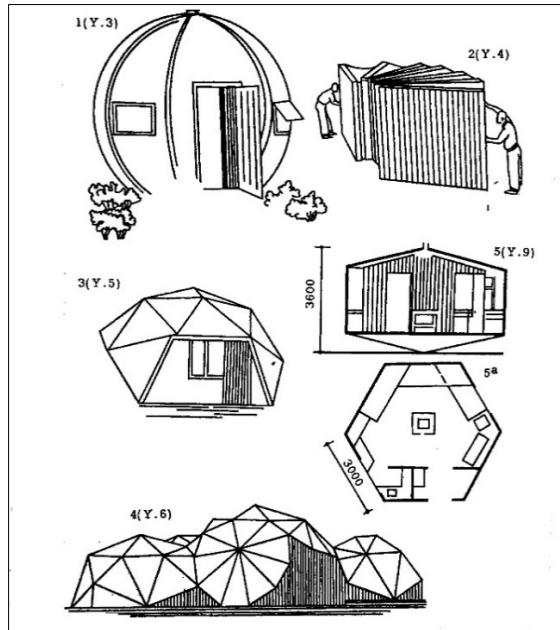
Prefabricated and portable housings in abroad 1-Spheric house (Germany) 2-Accordionic dwelling (USA) 3-Camping house (England) 4-Dome range dwelling (England) 5-Prefabricated housing (Russian Federation) a. Plan [20]
